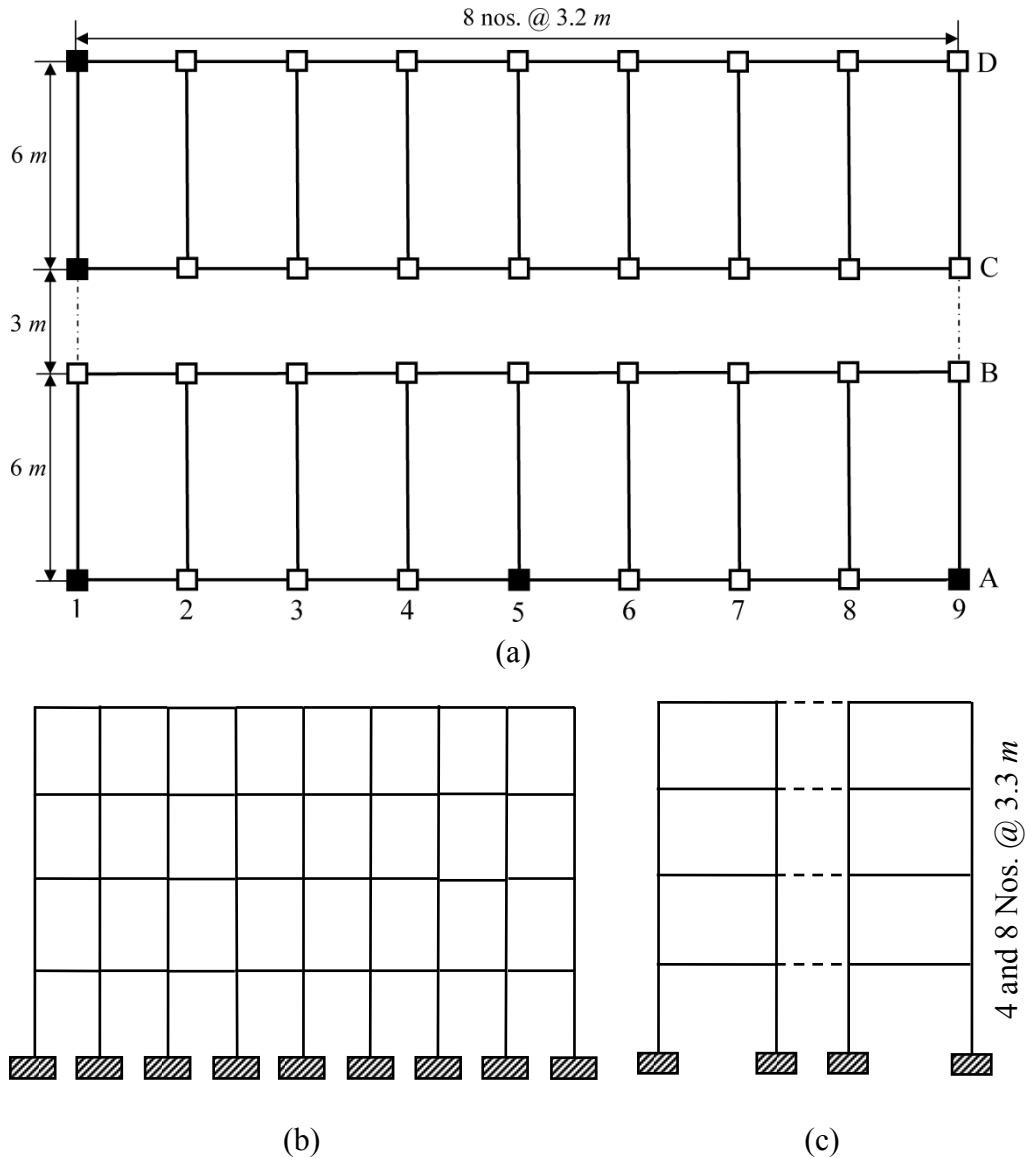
(a) Plan of the considered buildings (columns with black shade are the representative columns chosen for detailed investigation); (b) front and (c) side elevation of the considered buildings (the dotted lines represent the floor slabs rigid in plane).
